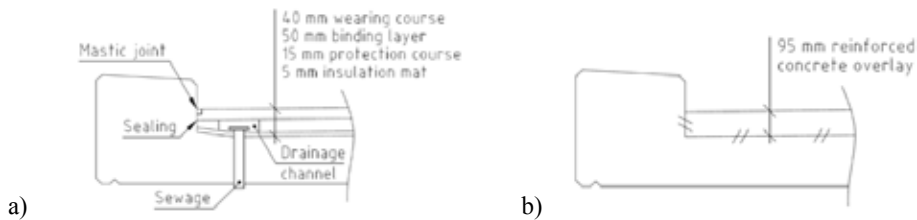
Typical and common solutions for protection of structural bridge decks by insulation mat etc. (a) and directly cast concrete overlay (b).
